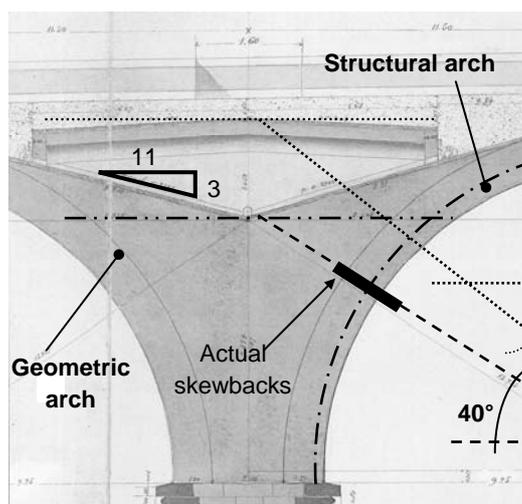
Verde viaduct*: section on the pier. Internal spandrels over the backfill.
